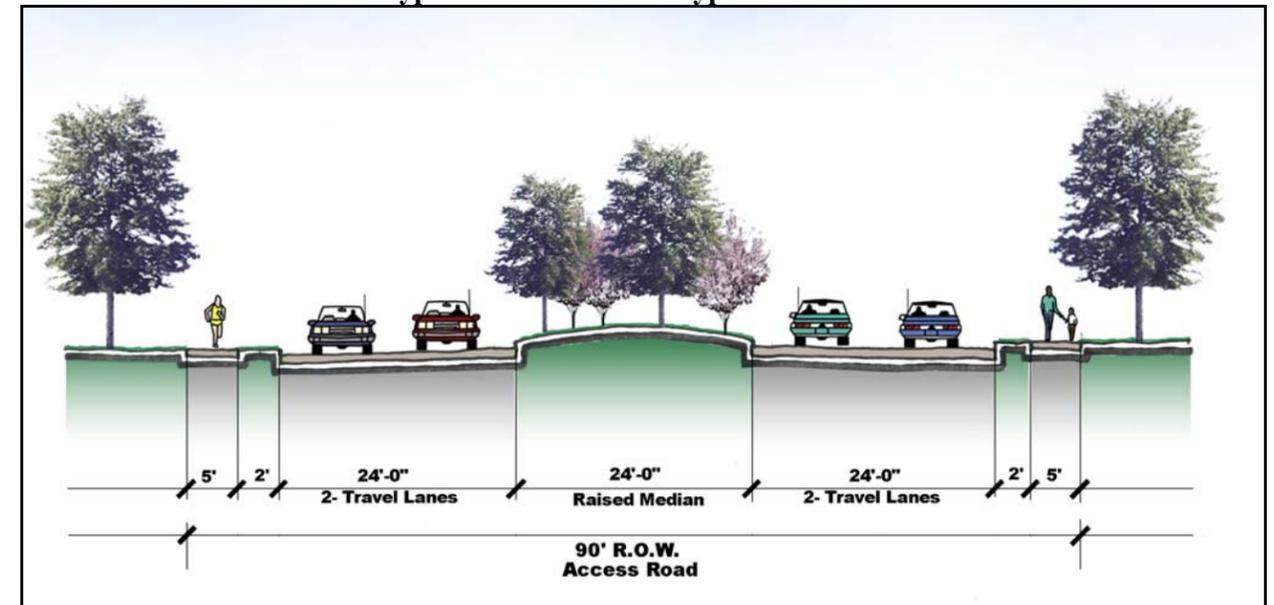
Typical Cross-Section: Type II Parallel Access Road
